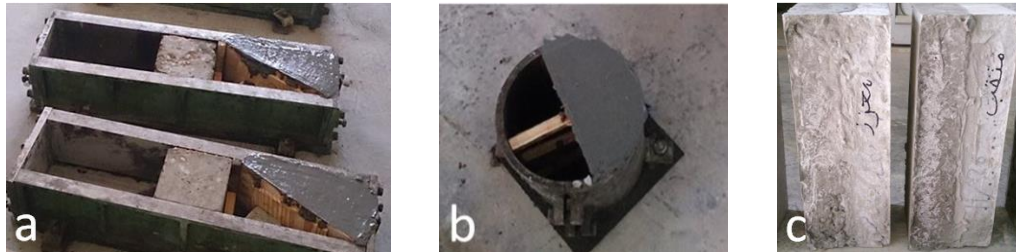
Specimens preparation. (a) Slant shear test specimen (b) Splitting tensile test specimen (c) shrinkage test specimen.
